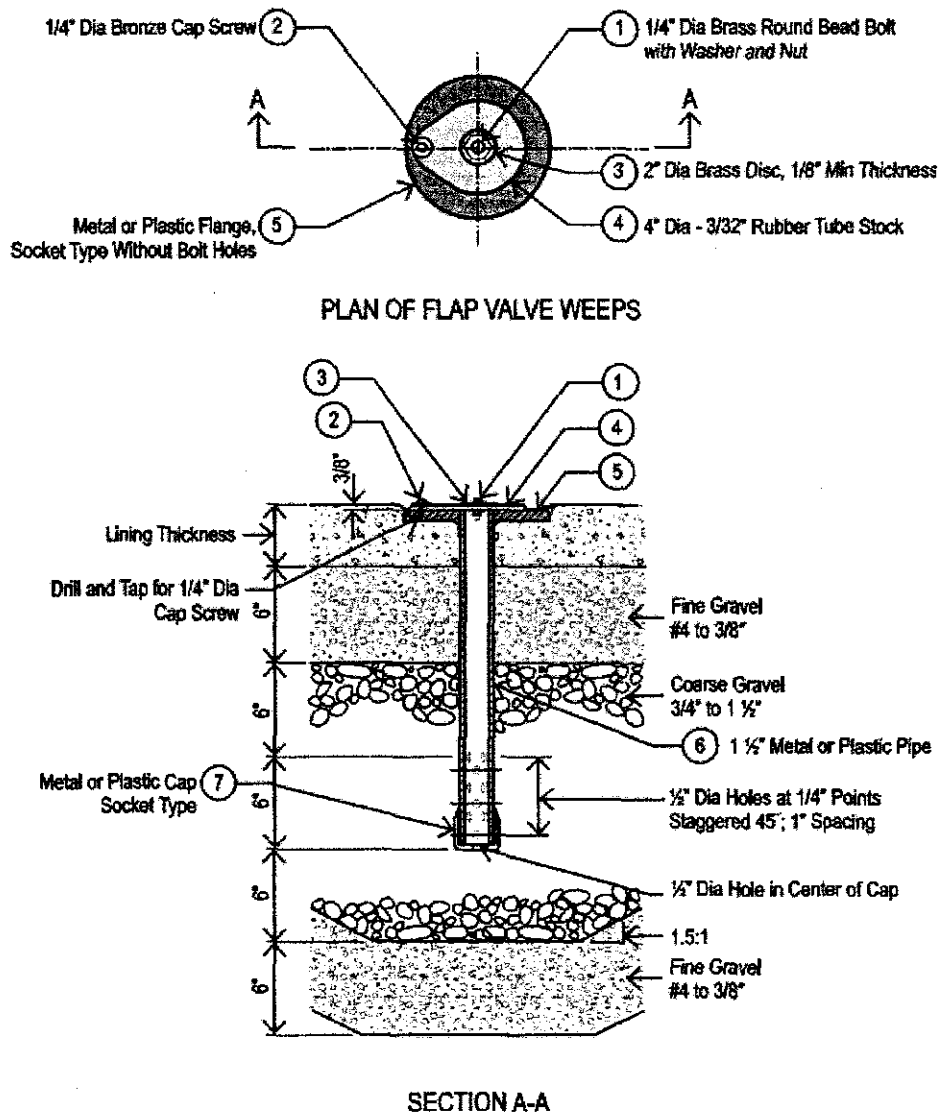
Flap Valve Installation for a Channel Underdrain
